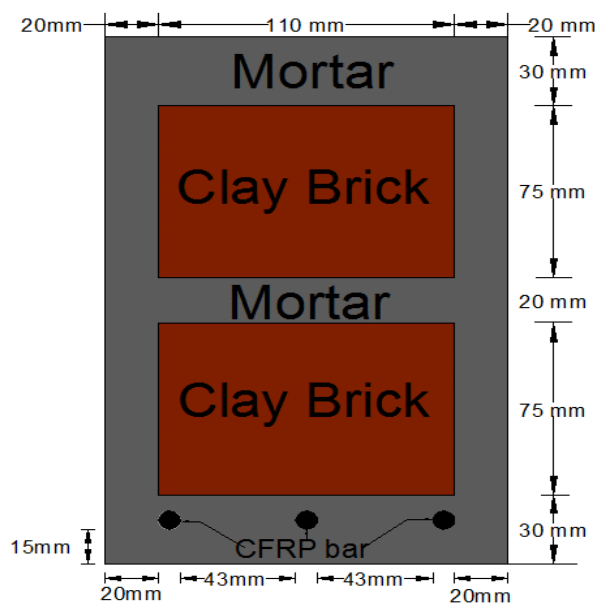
(a) Cross-section of reinforced masonry beam with cement mortar as bed joint
